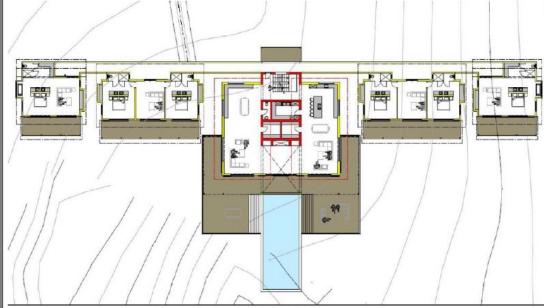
PROPOSED MAIN DWELLING HOUSE
